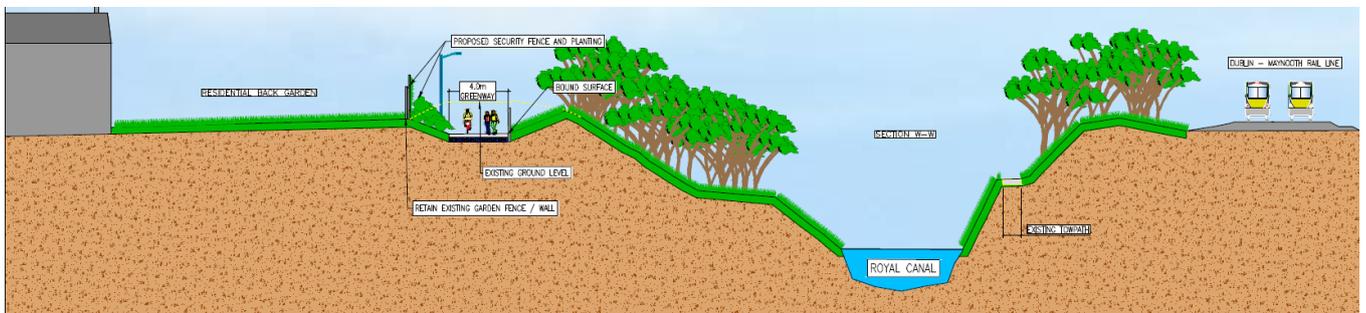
Cross section of the proposed greenway behind the back gardens of the residents of Delwood Park.
